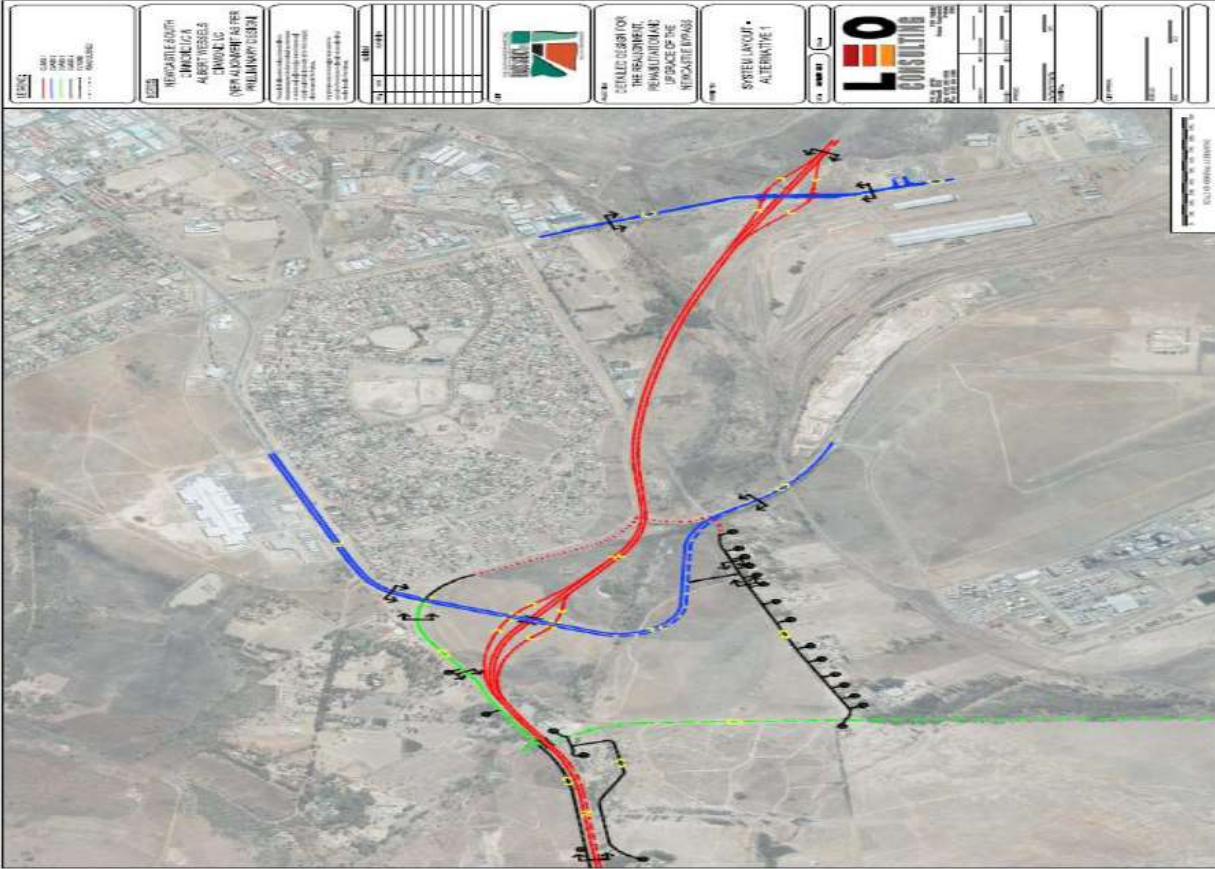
Map showing the locality of Bypass Alternative Layout 1 (Source: Nema Consulting).
